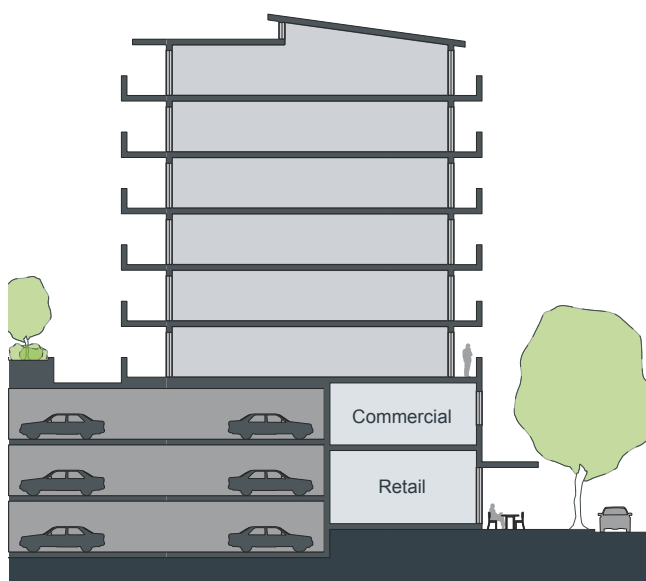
J.8 Above ground parking should be concealed behind the building facade and wrapped with other uses along the primary street frontage, such as retail, commercial or two storey SOHO units
